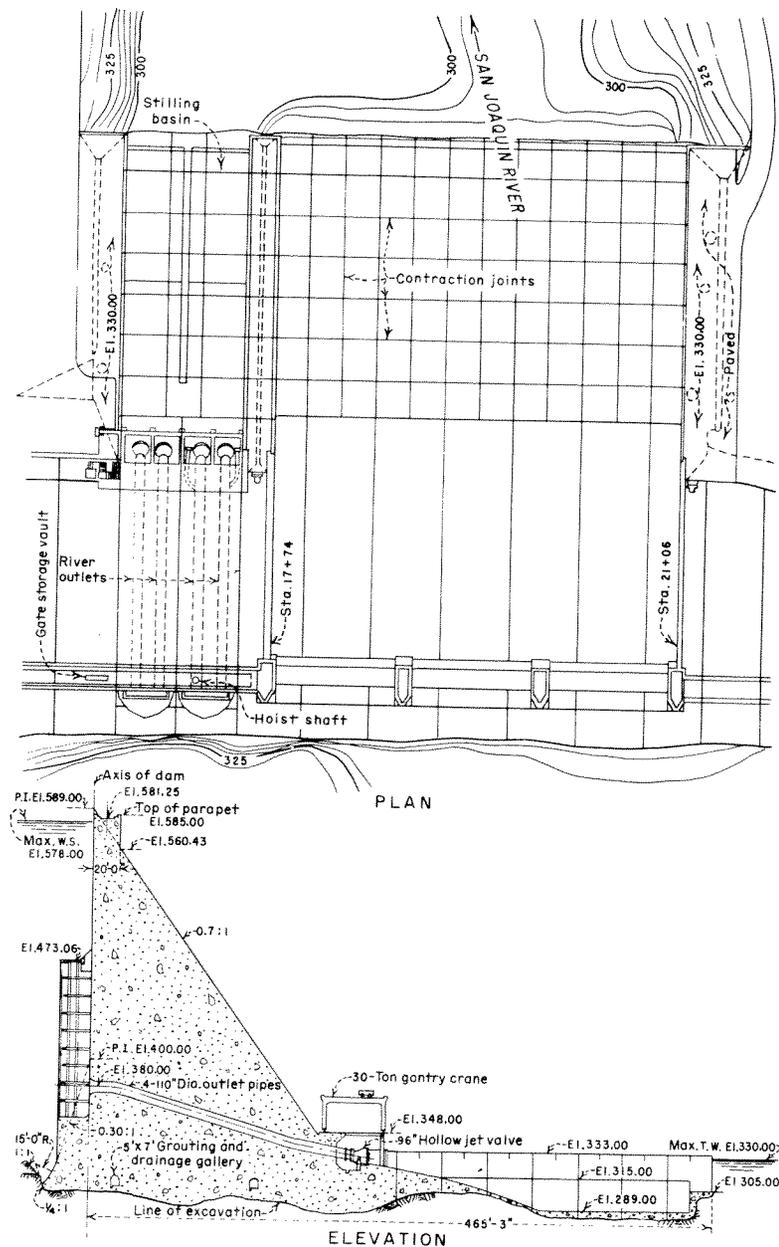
PLAN AND ELEVATION OF RIVER OUTLETS
